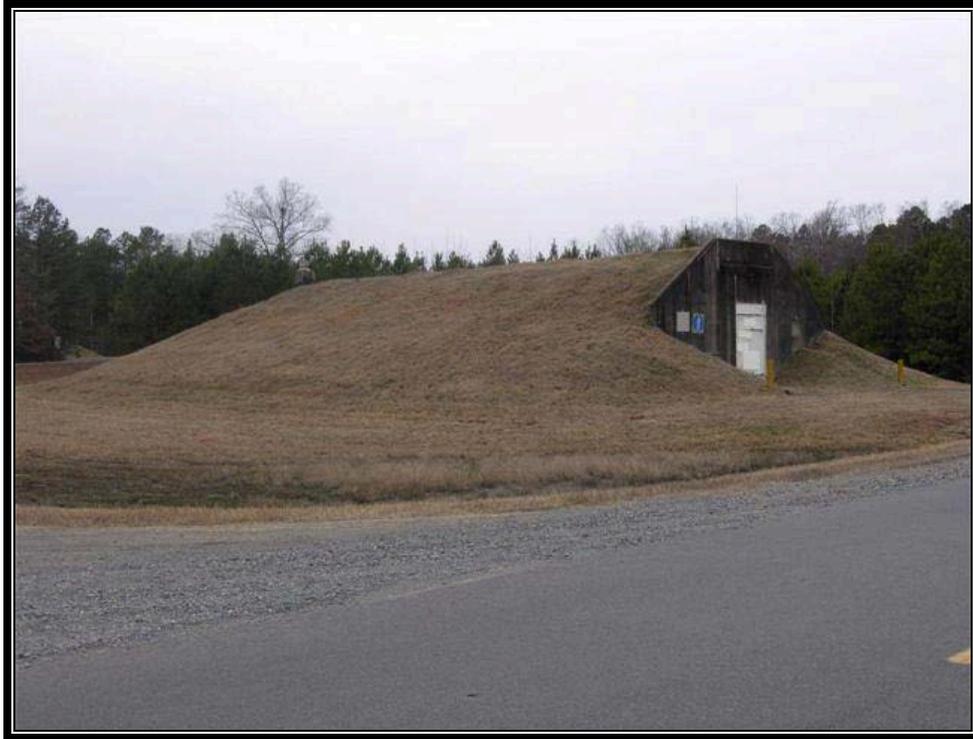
Typical igloo storage with truncated walls of the Huntsville type (Courtesy U.S. Army, 2007)
